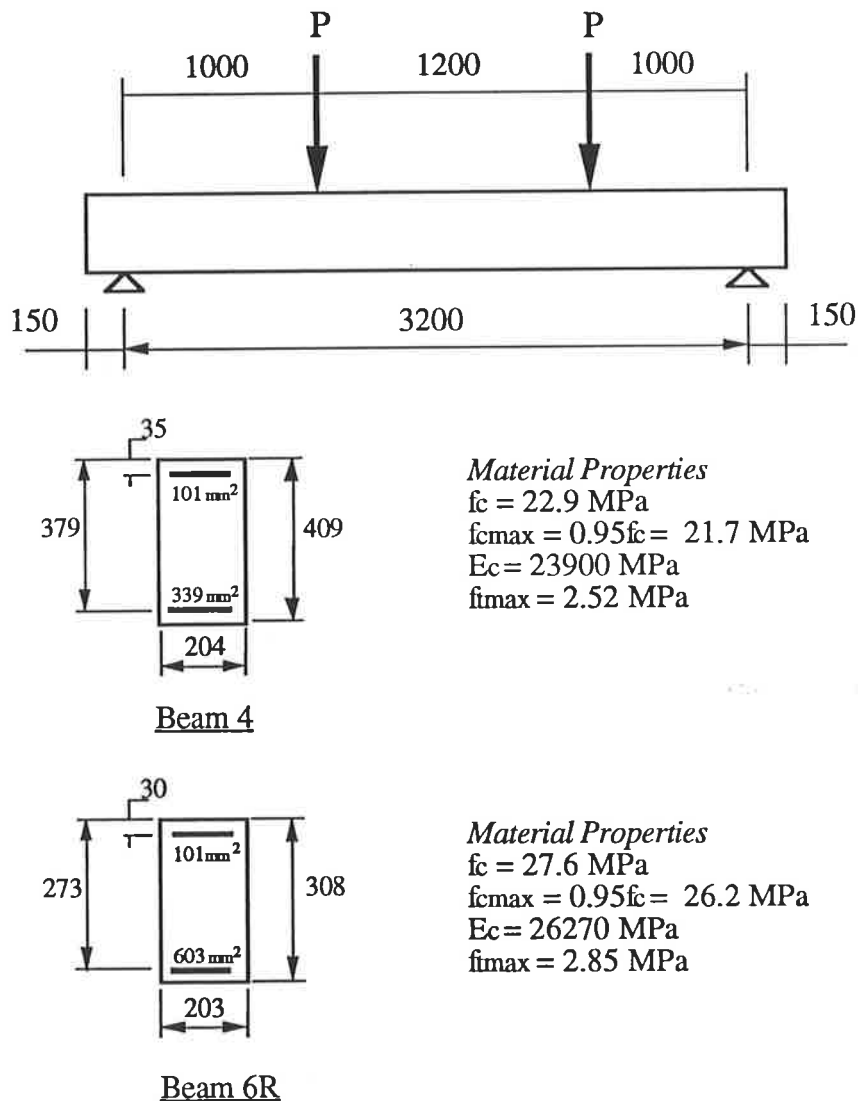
Test set-up for beams tested by Clark and Spiers (1978)
